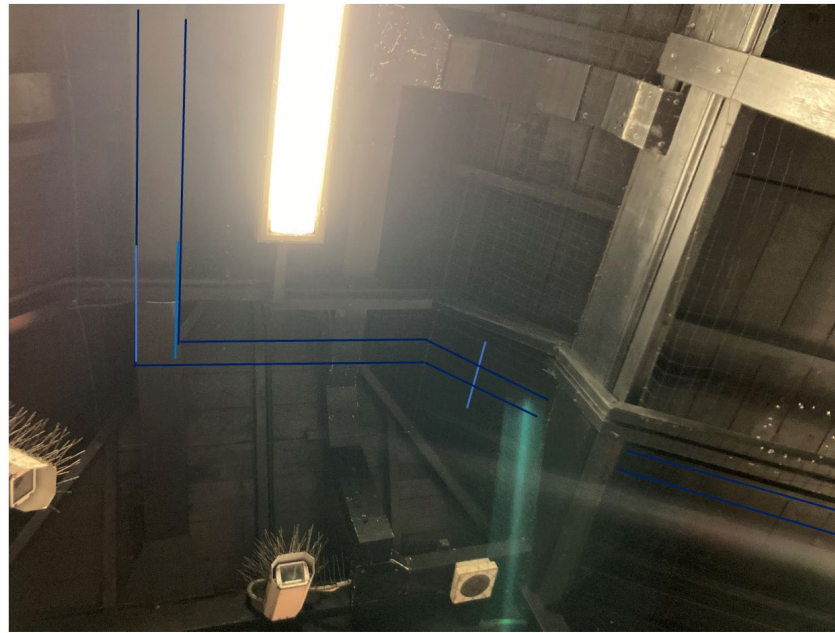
New OPO/OTC CRMS plat 2 footbridge
